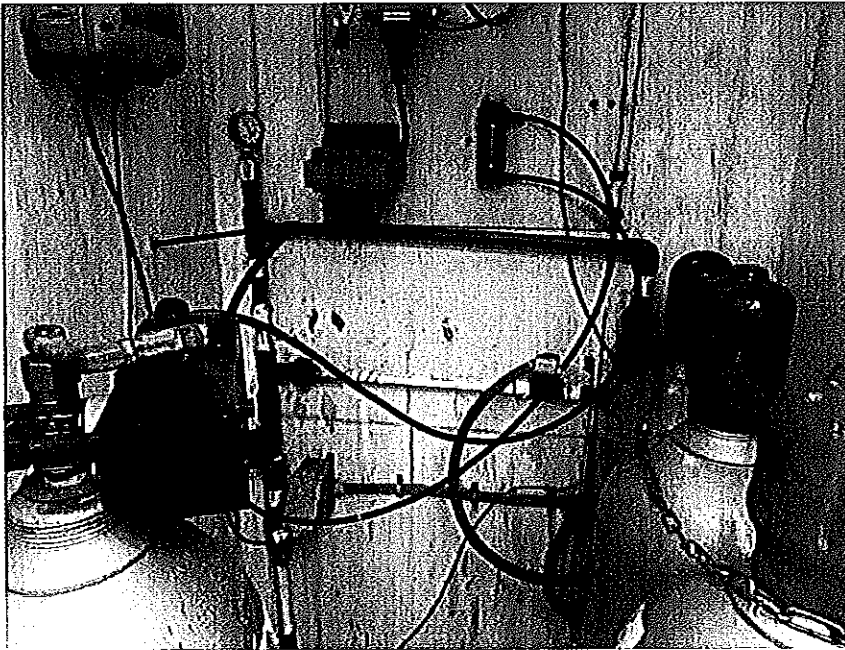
View of PVC pipes inside ancillary shed containing chlorine.
